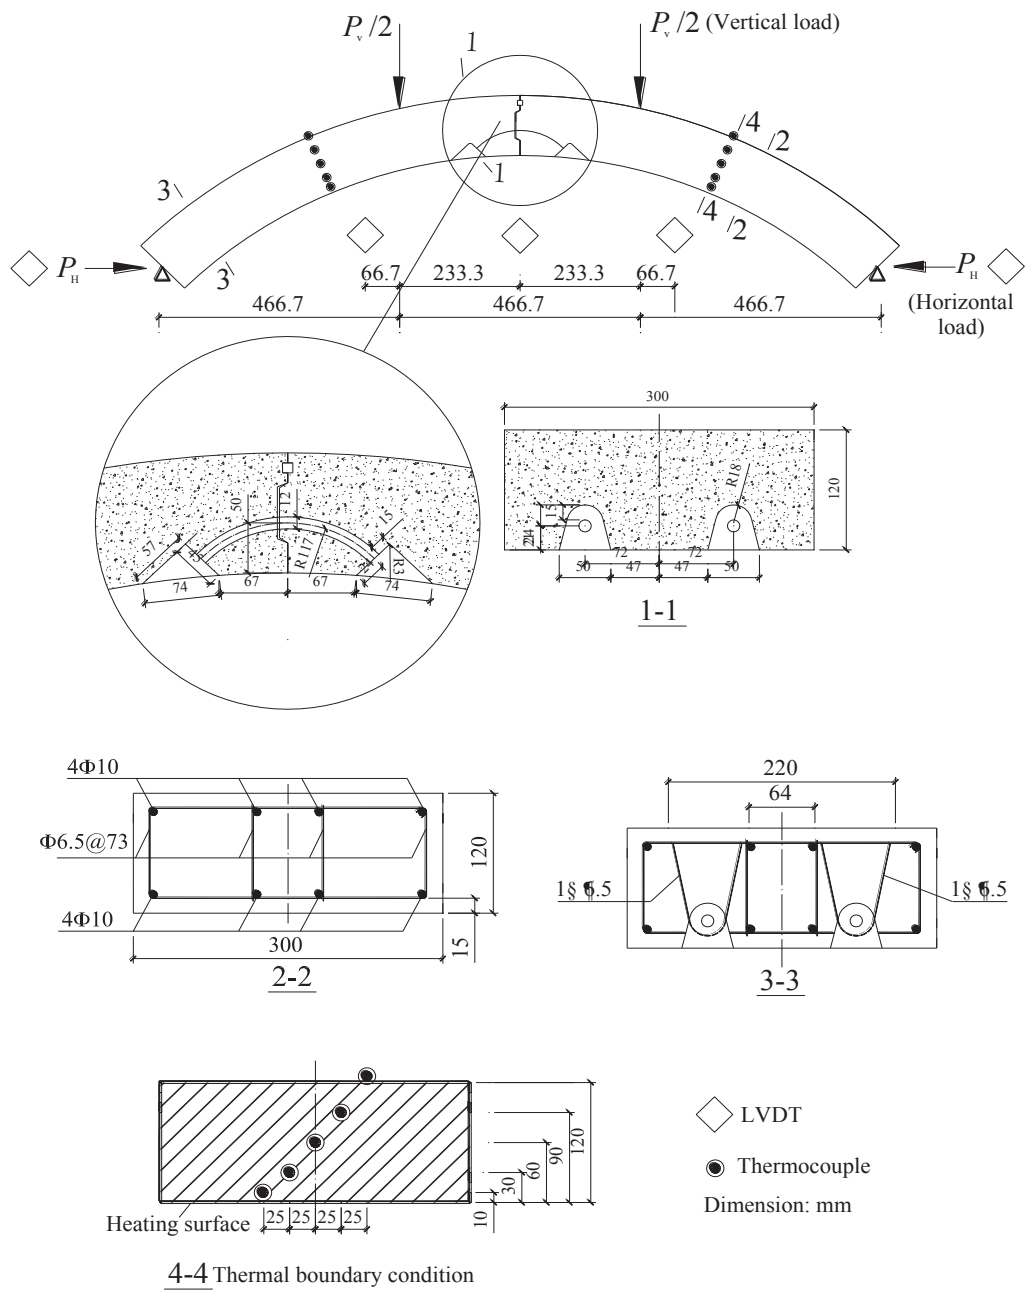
Configuration of joint assembly, reinforcement arrangement for the RC lining segments, and instrumentation
